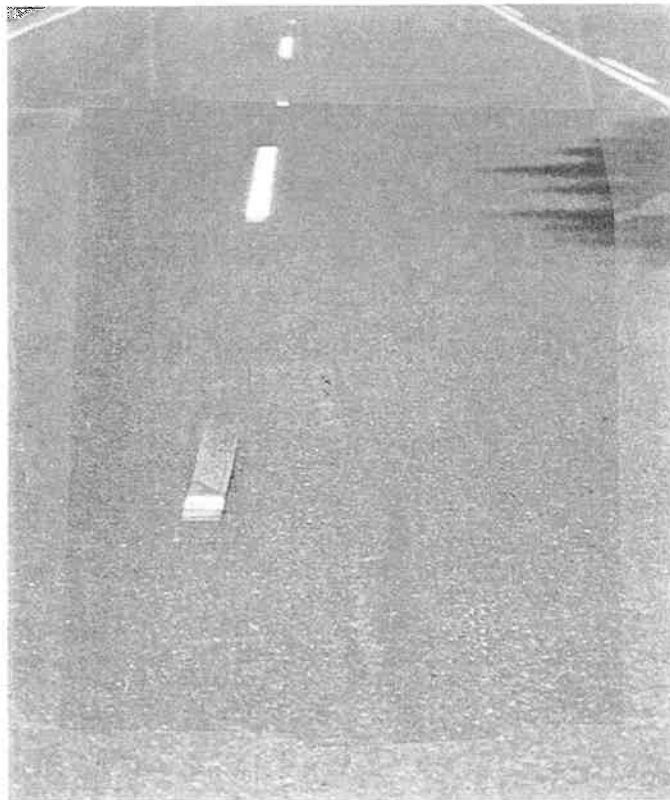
Section where asphalt chunk was dragged by paver near mile point 5.4.
